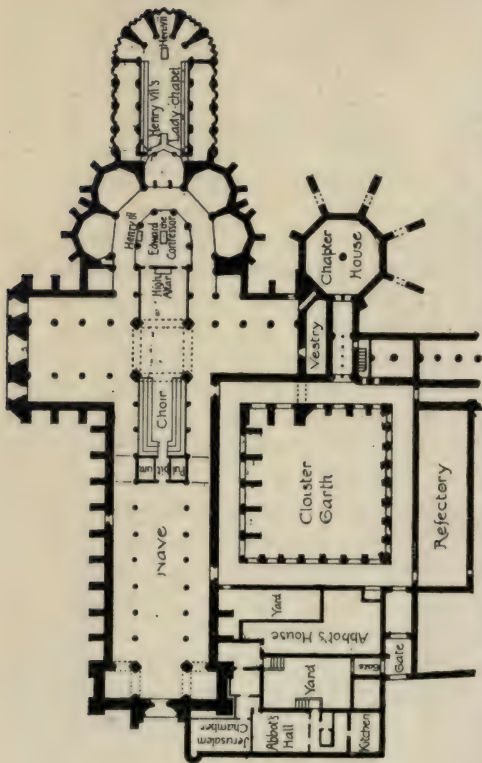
THE FRENCH PLAN: WESTMINSTER ABBEY
